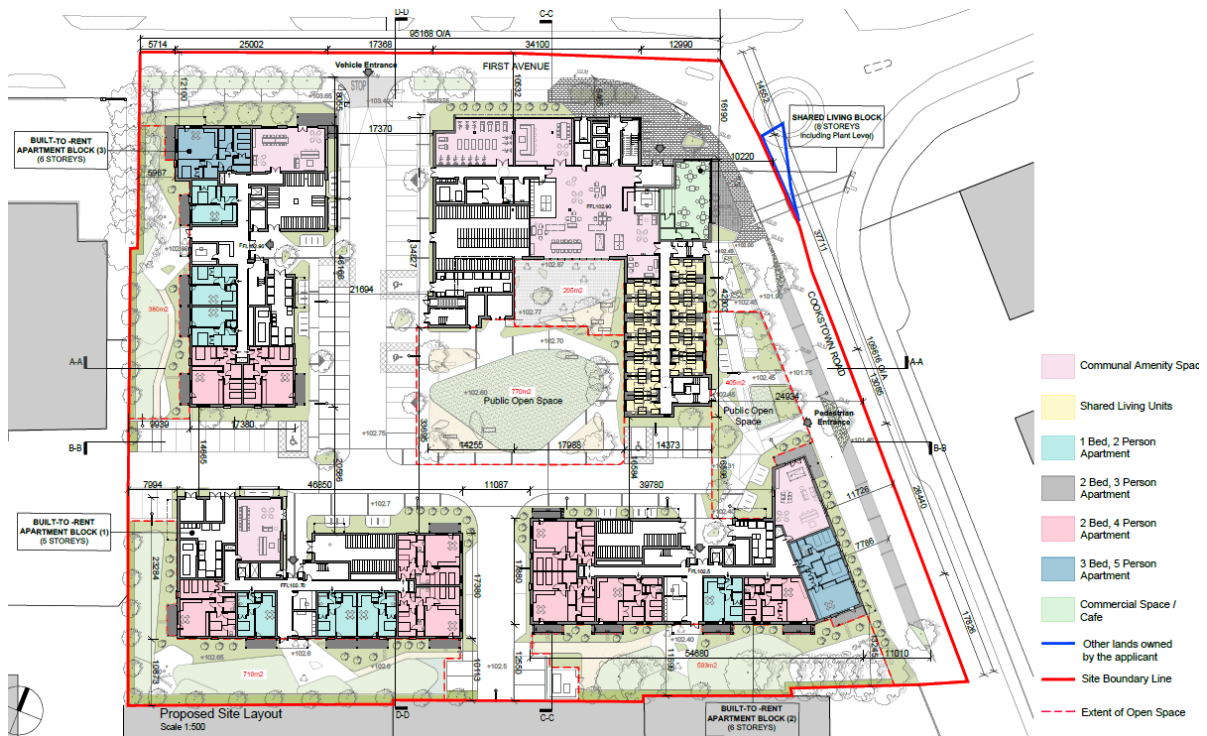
Site layout plan of the development proposed under An Bord Pleanála Case No. 303911-19
